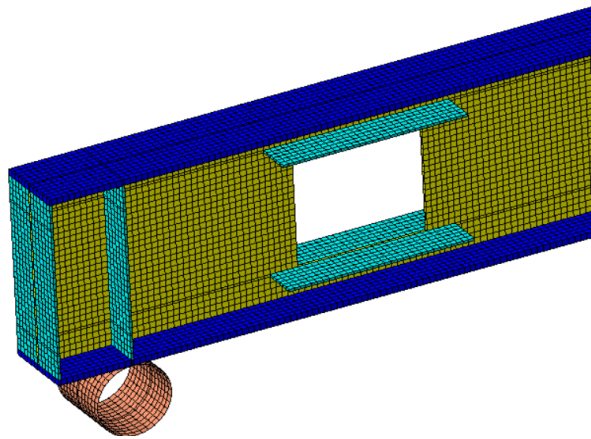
15m-S-OP-3-plate welded around the opening
